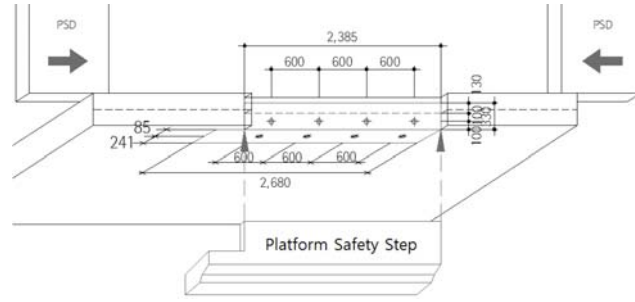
Conceptual Drawing of Safety Step Anchor Bolt Installation
